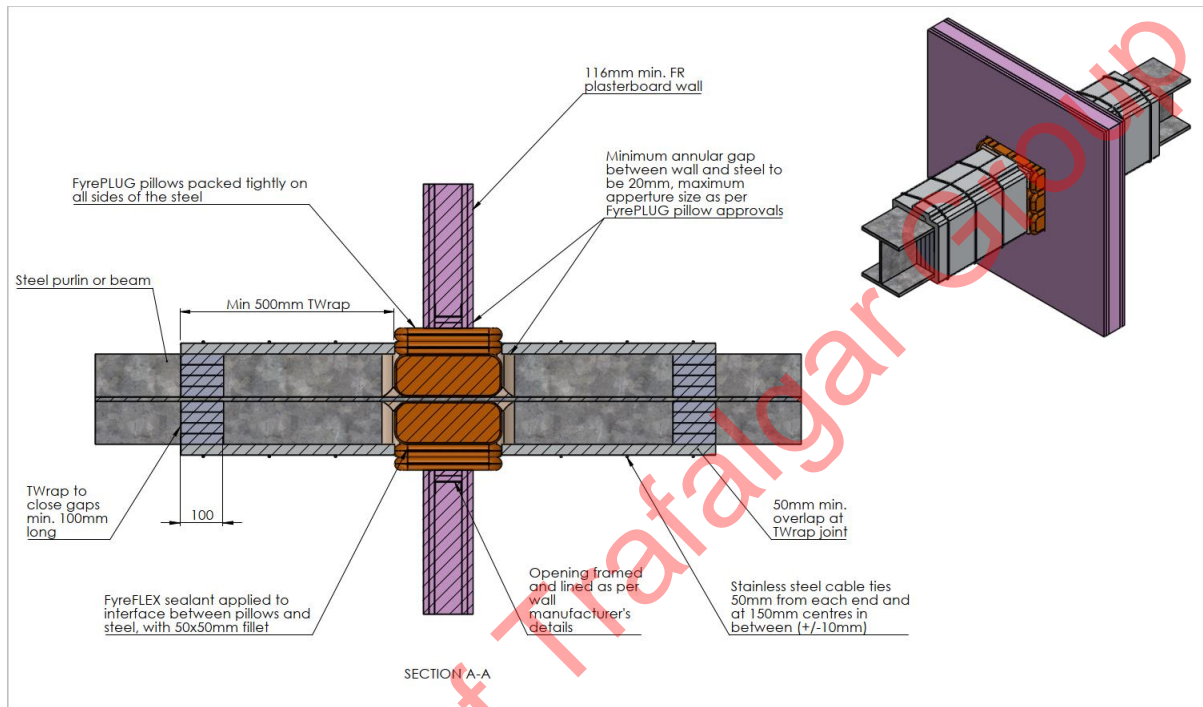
Proposed steel beam/purlin penetration system – detail 1
